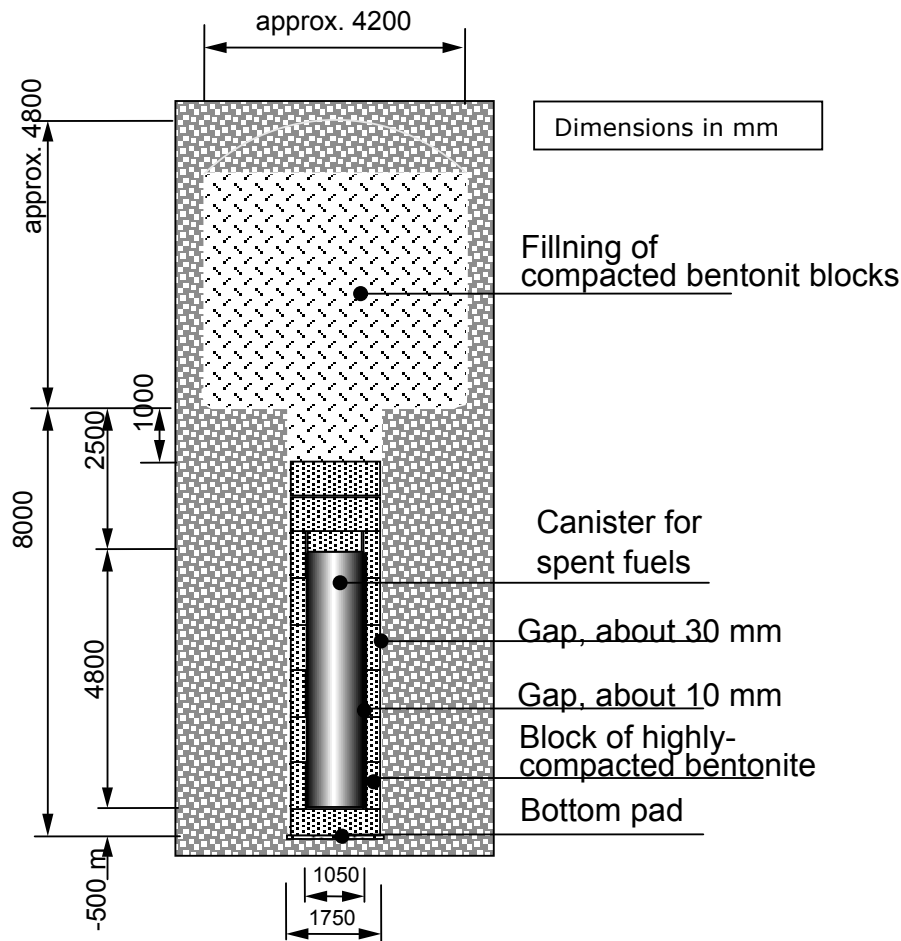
Cross-section of deposition tunnel, schematic drawing.
